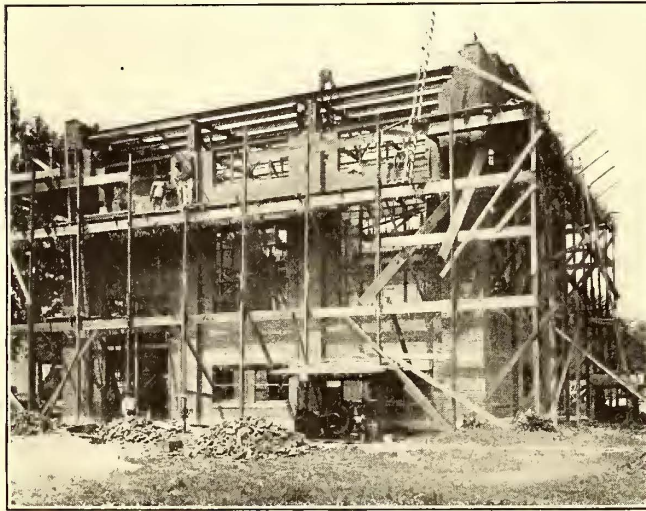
SUBSTATION UNDER CONSTRUCTION, SHOWING TRUCK ENTRANCE AND CRANE SUPPORT
